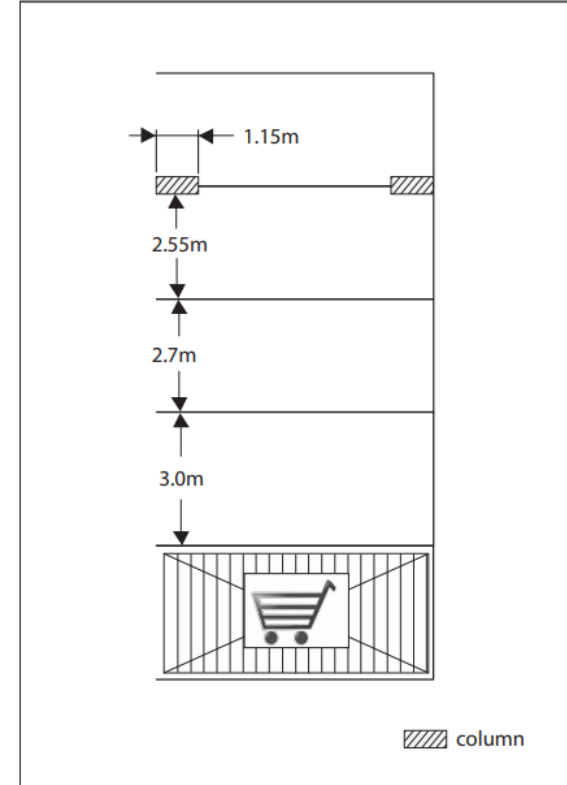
Parking Space Dimensions, Perpendicular to Aisle
